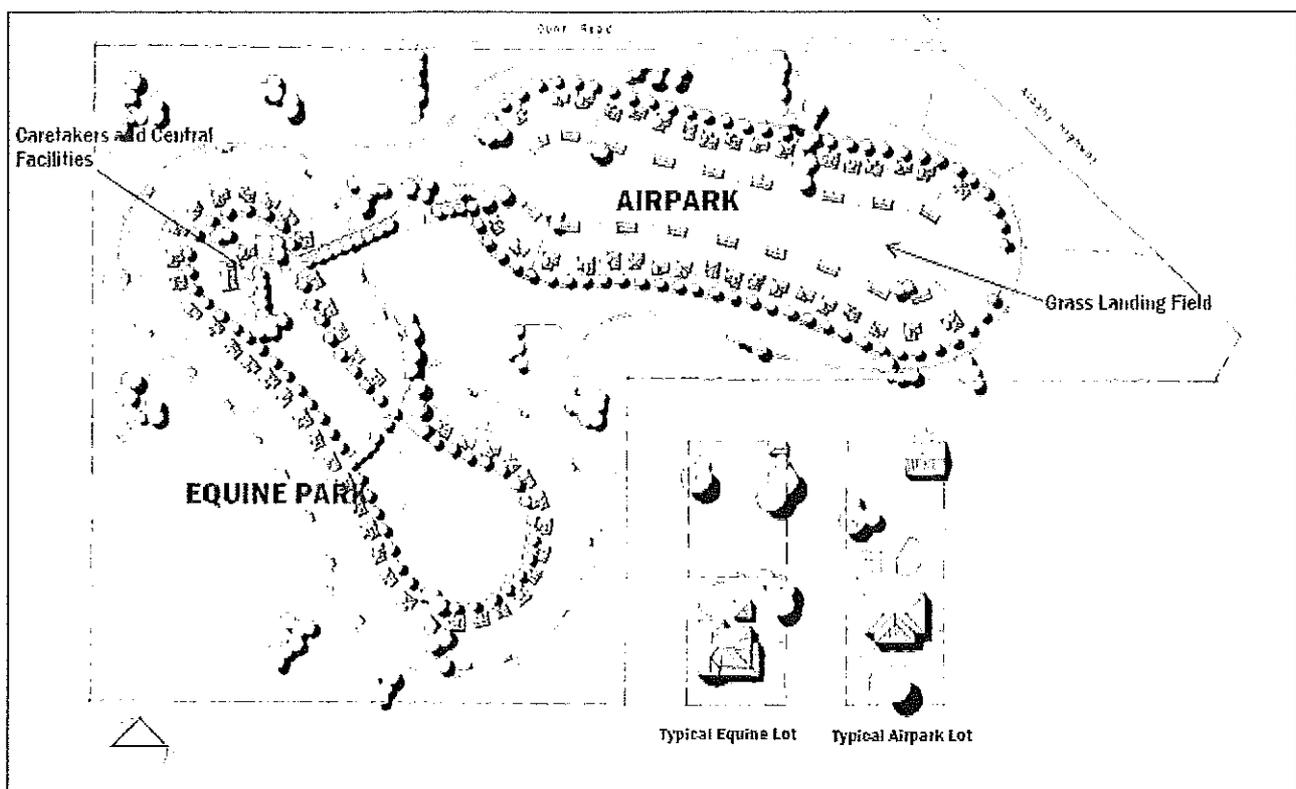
SITE PLAN - "Proposed Albany Equine Centre and Airpark"
